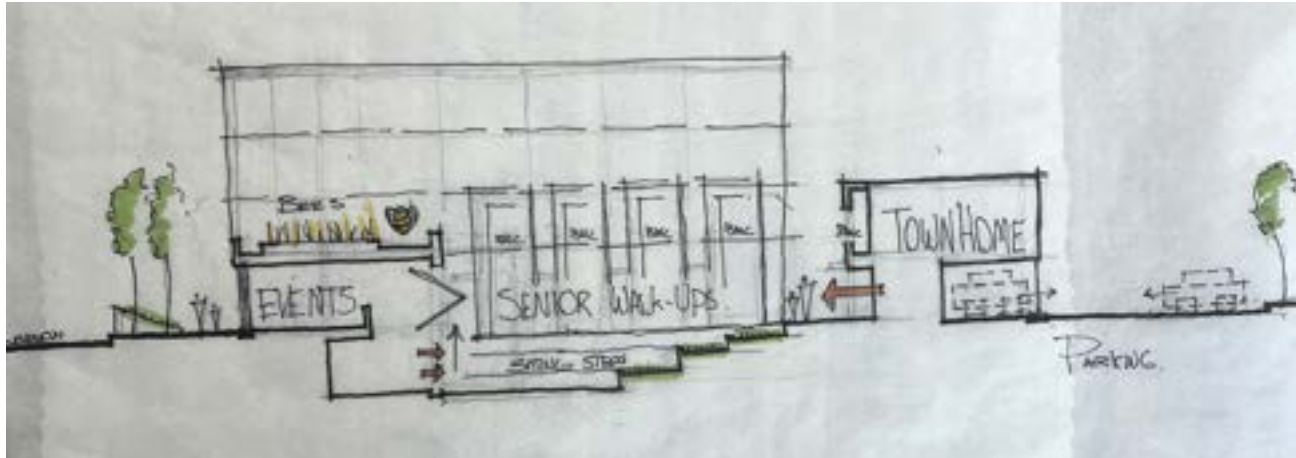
Architect's preliminary sketch of the sectional design of the proposed use for the site.
